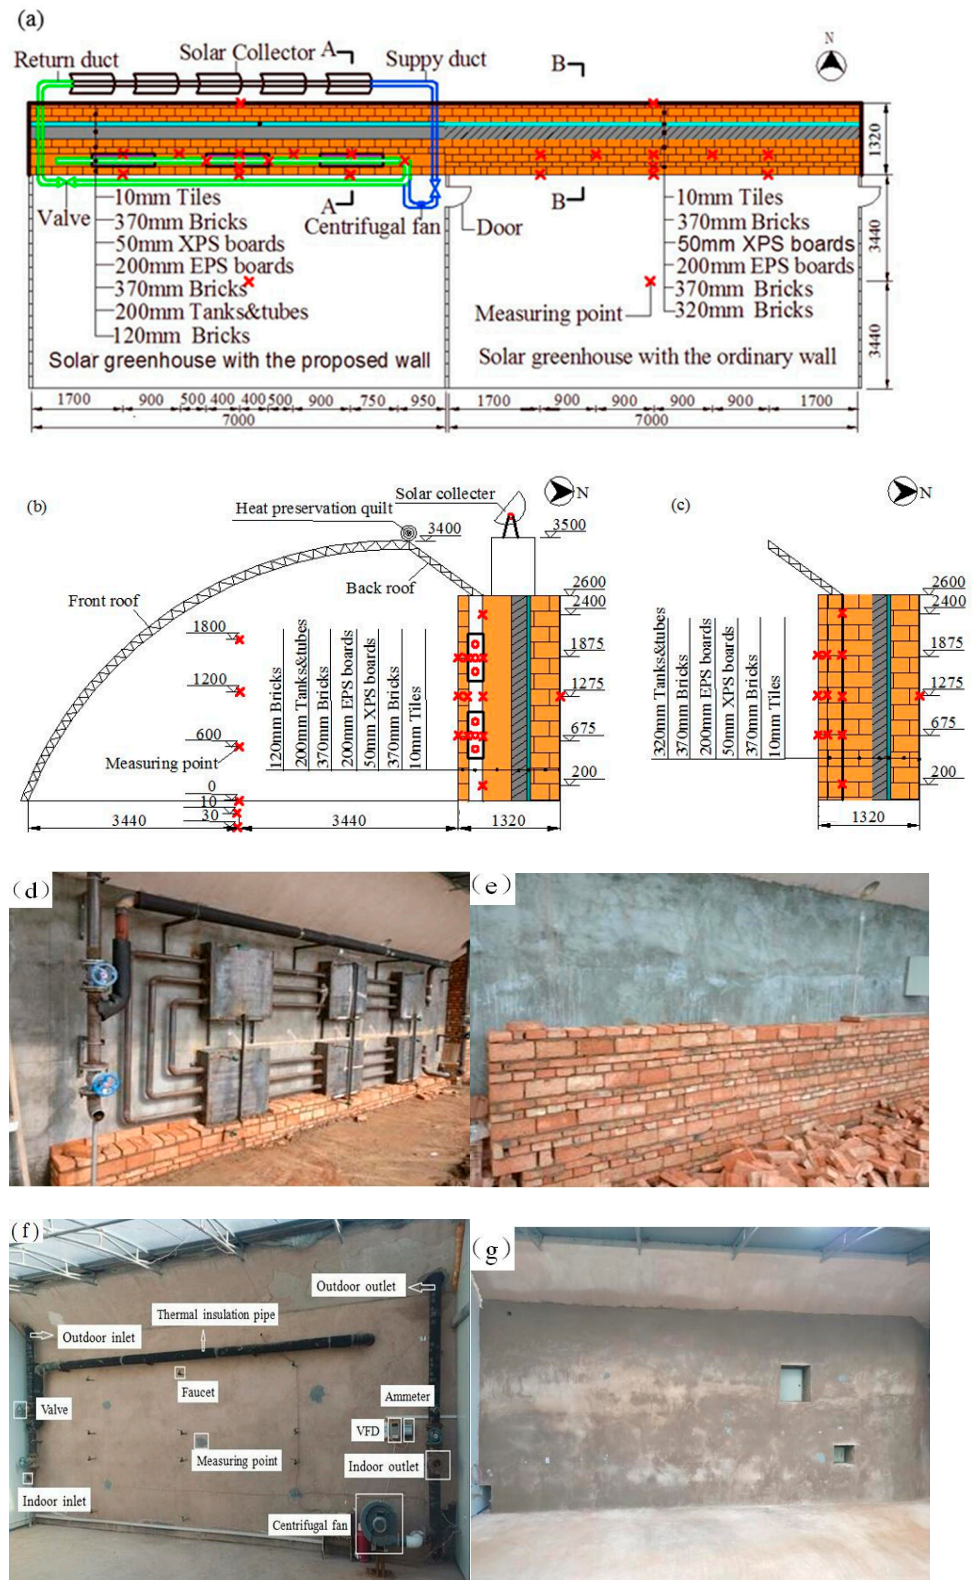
Illustrations of the experiment greenhouses: (a) schematic plan; (b) section A-A; (c) section B-B; (d) the construction process diagram of the proposed wall with the APHSWS; (e) the construction process diagram of ordinary wall without the APHSWS; (f) the interior real picture with the proposed wall; (g) the interior real picture with ordinary wall. (Note: In the (b,c), the red cross represents the specific arrangement of measurement points for the experiment, the red circle represents the pipeline).
